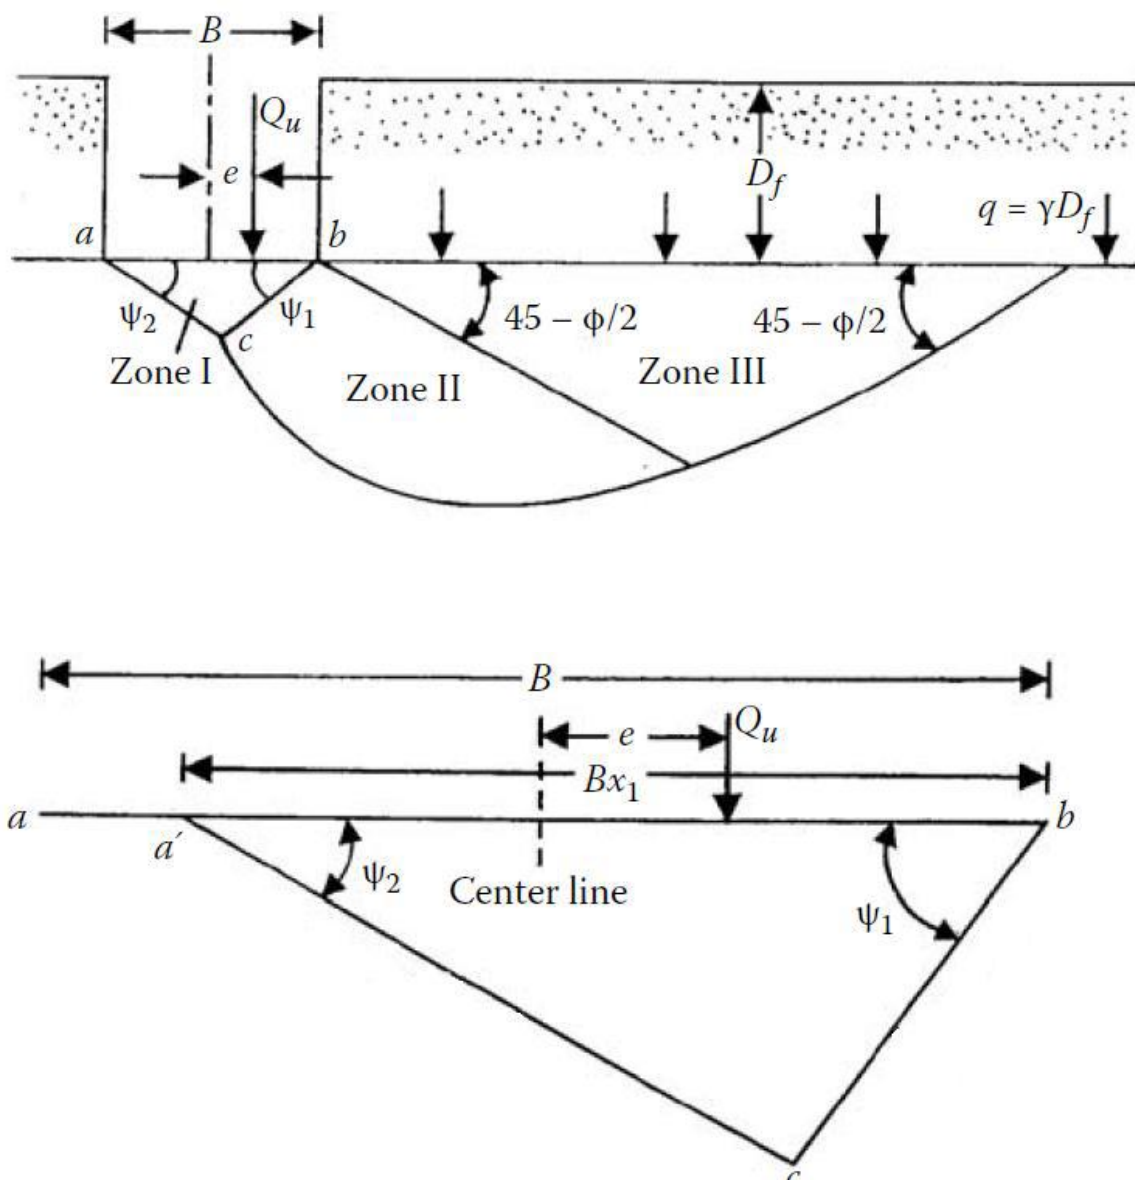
Eccentrically loaded rough continuous foundation (source: Das, B. M. 2009)
